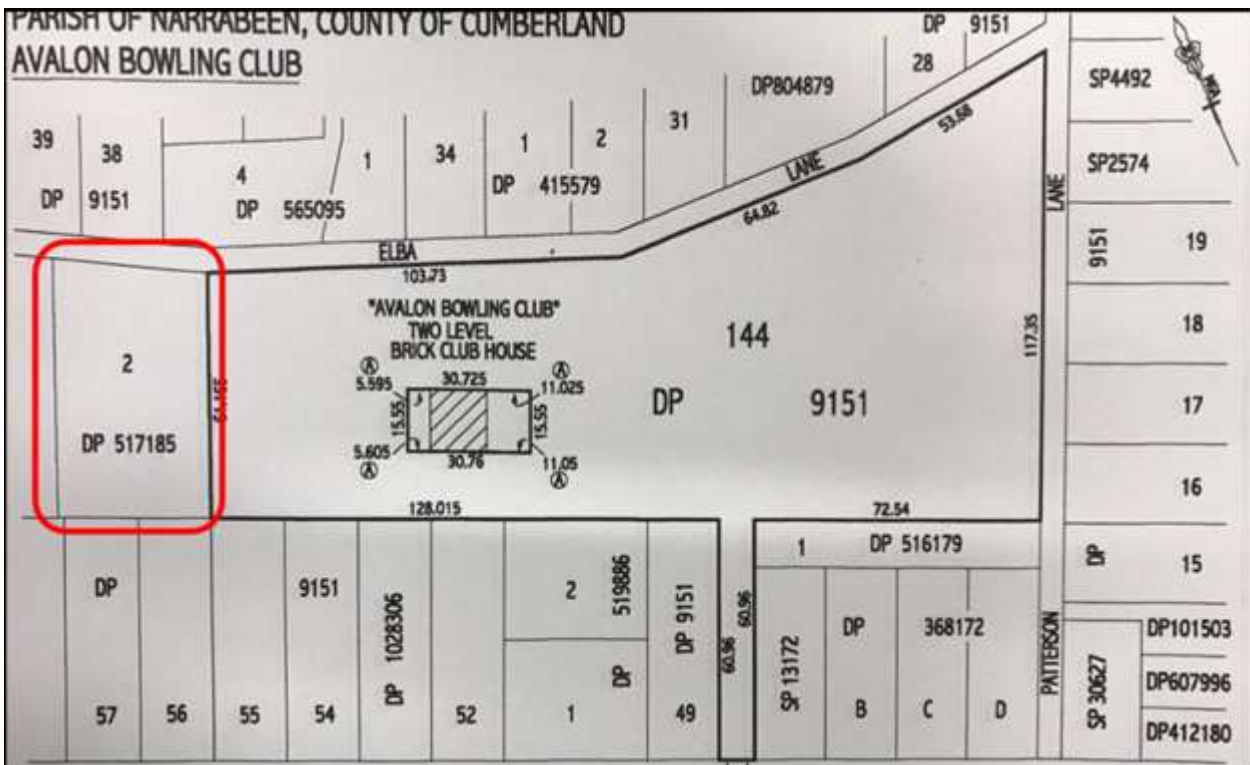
Plan of Subdivision Prior to Consolidation; Highlighted in Red, Lot 2 DP 517185 (Green 3).
